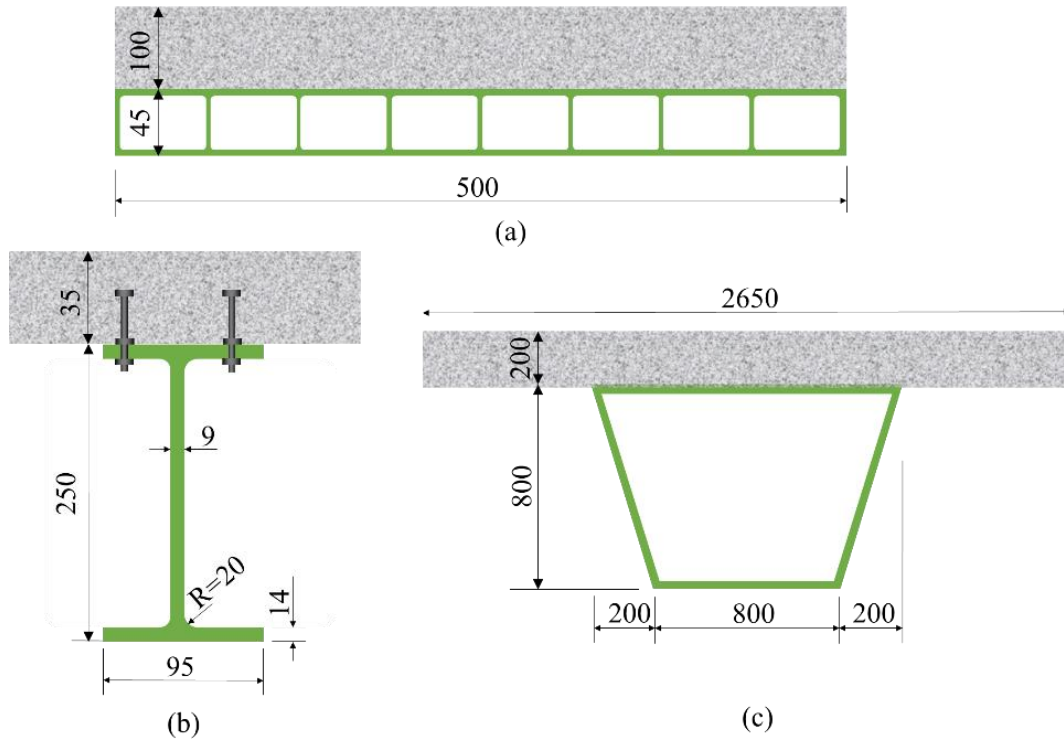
Typical cross section of: (a) FRP-concrete hybrid deck [2]; (b) open-section FRP-concrete hybrid beam [3]; and (c) closed-section FRP-concrete hybrid beam [4]. Unit in mm.
